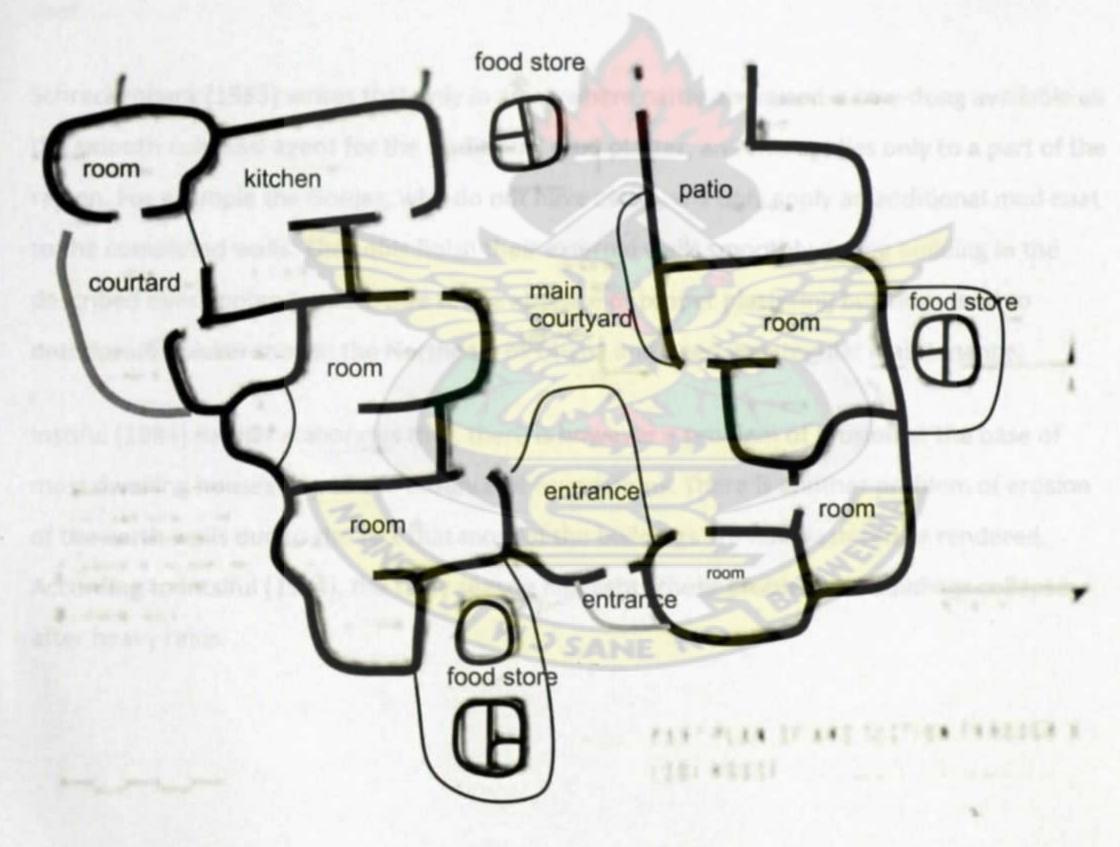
, Layout of typical vernacular house in upper west region (Source: Schreckenback, 1983)
